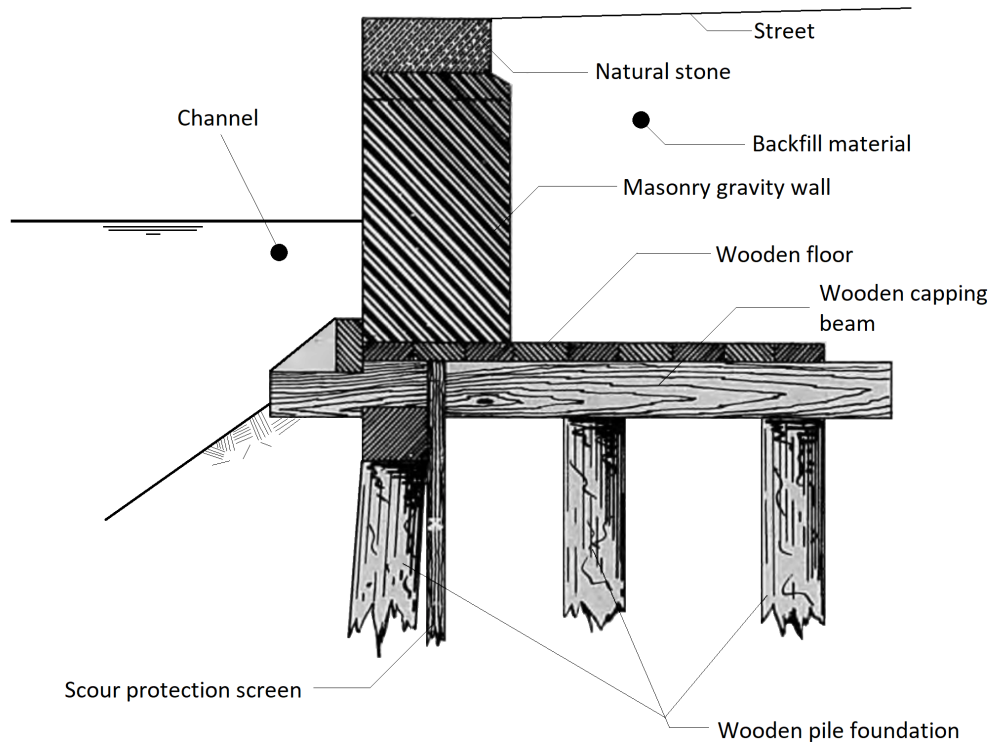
Typical cross-section of the quay wall design consisting of a gravity wall on piles (Stadsarchief Amsterdam, 1906).
